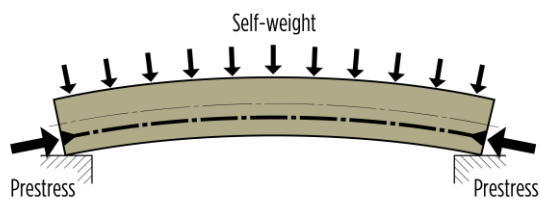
Simply Supported Prestressed Concrete Beam under Load
